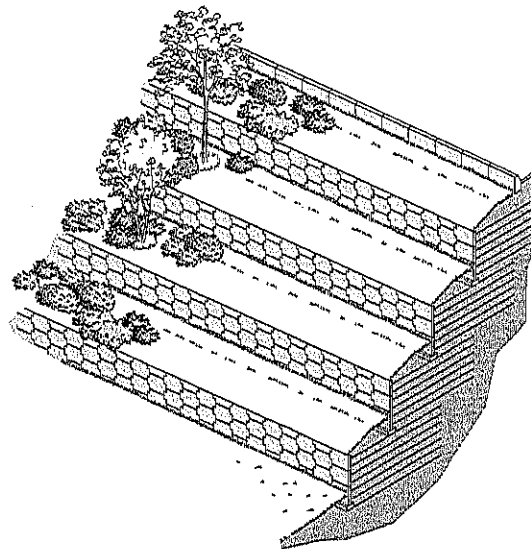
Tiered retaining structure of mechanically stabilized earth with landscaped benches (after Walkinshaw, 1975).
